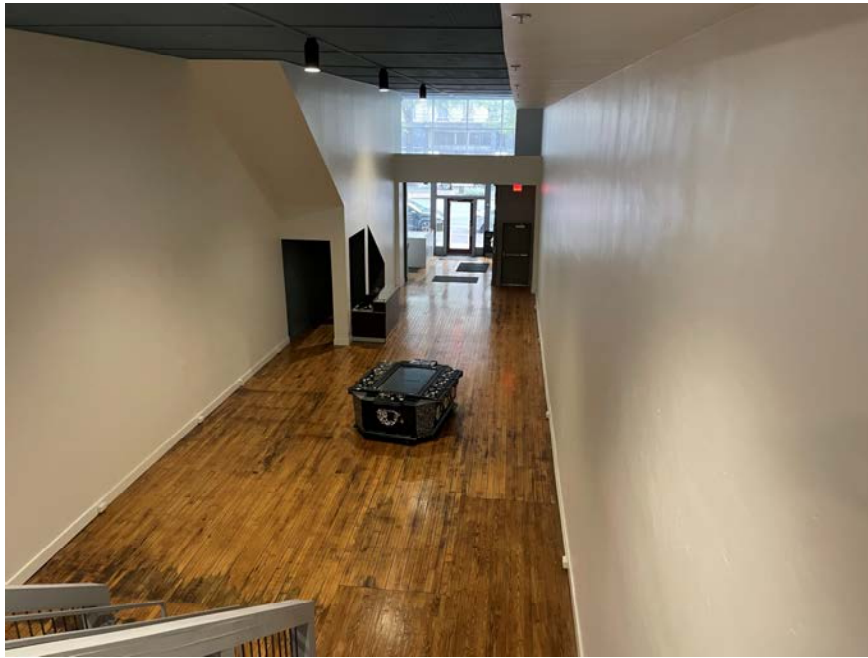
Interior 5 side floor 1-mezzanine looking to front at Broad St.
